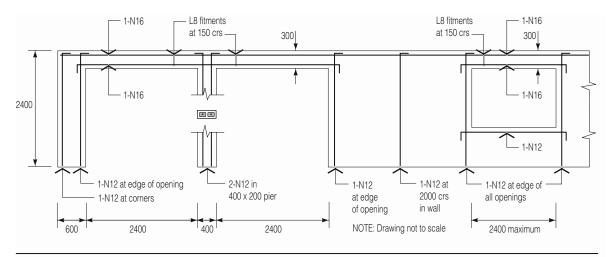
Wall Reinforcement for 190-mm Leaf for Wind Categories N1, N2 and N3 and 2400-mm Wall Height
